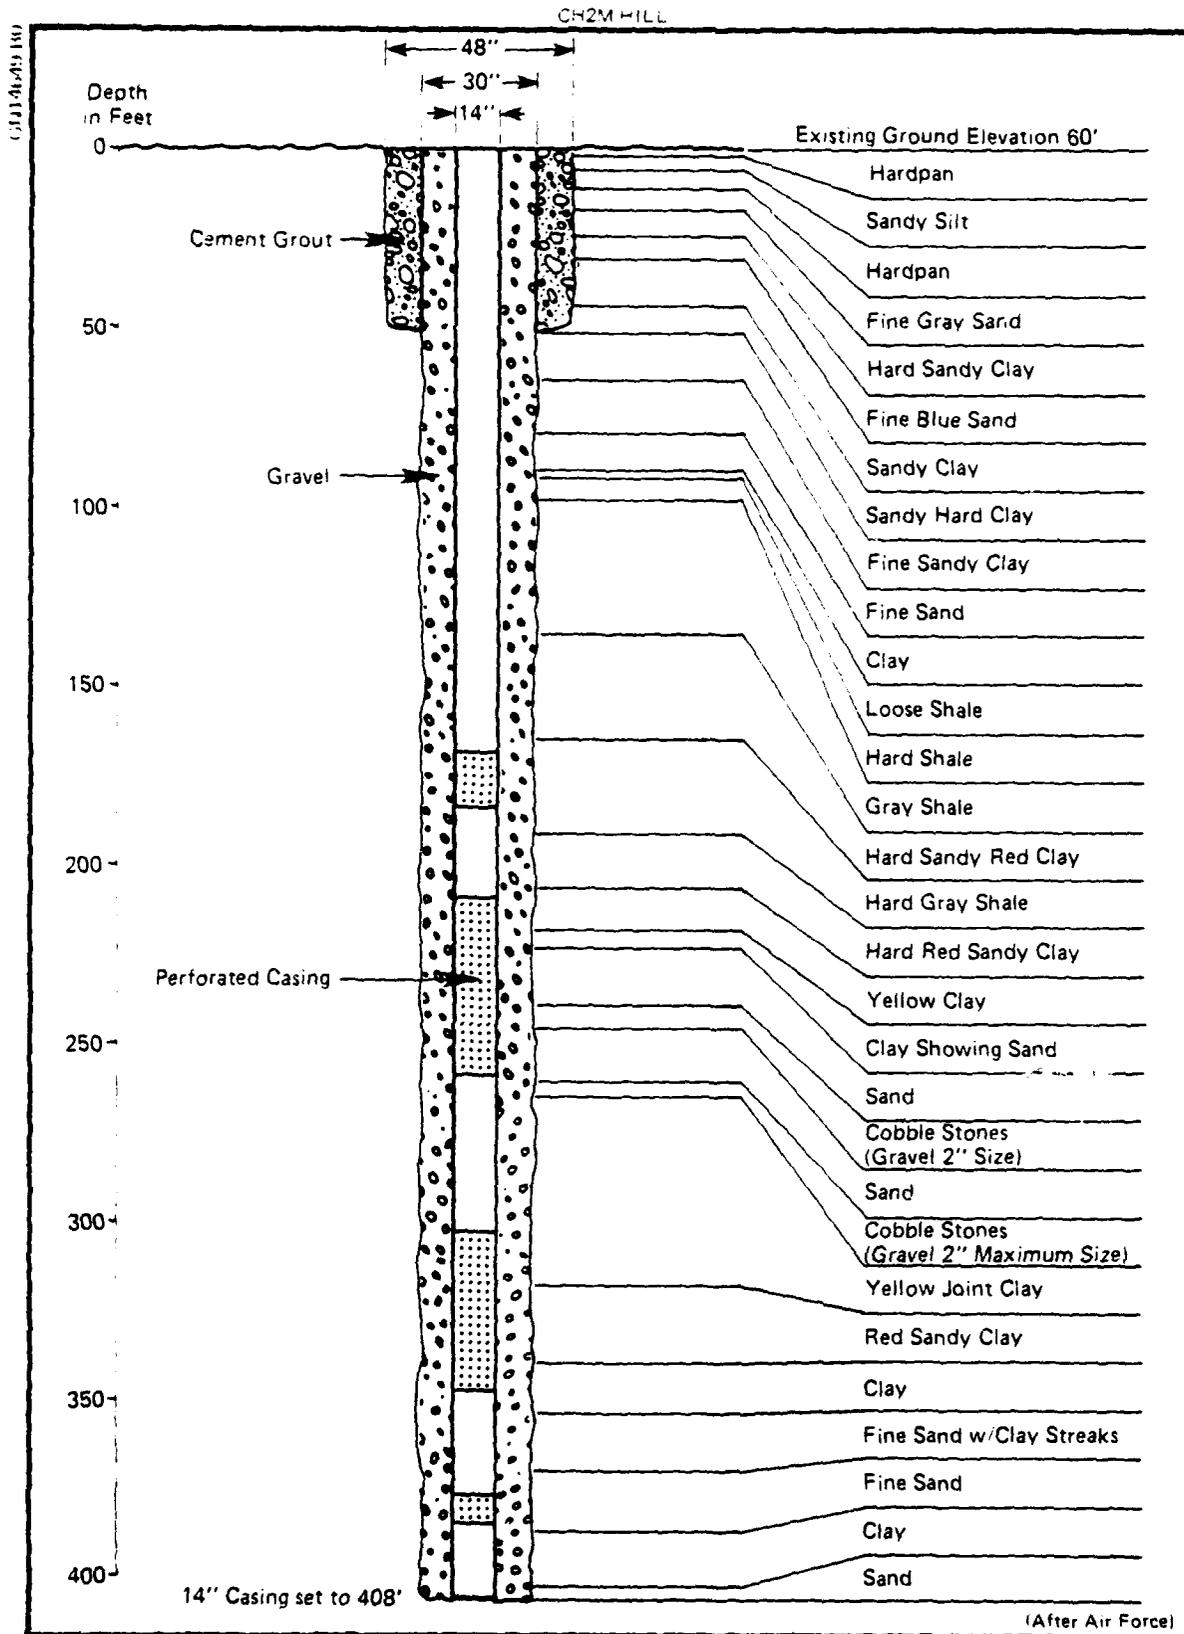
Log and well construction details of Well No. 18 at McClellan AFB.
